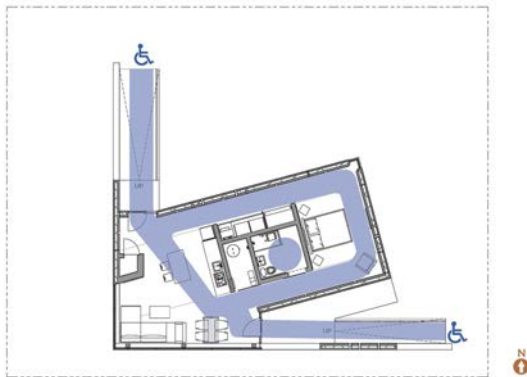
Accessible Plan of eNJoy! with ramps shown.
